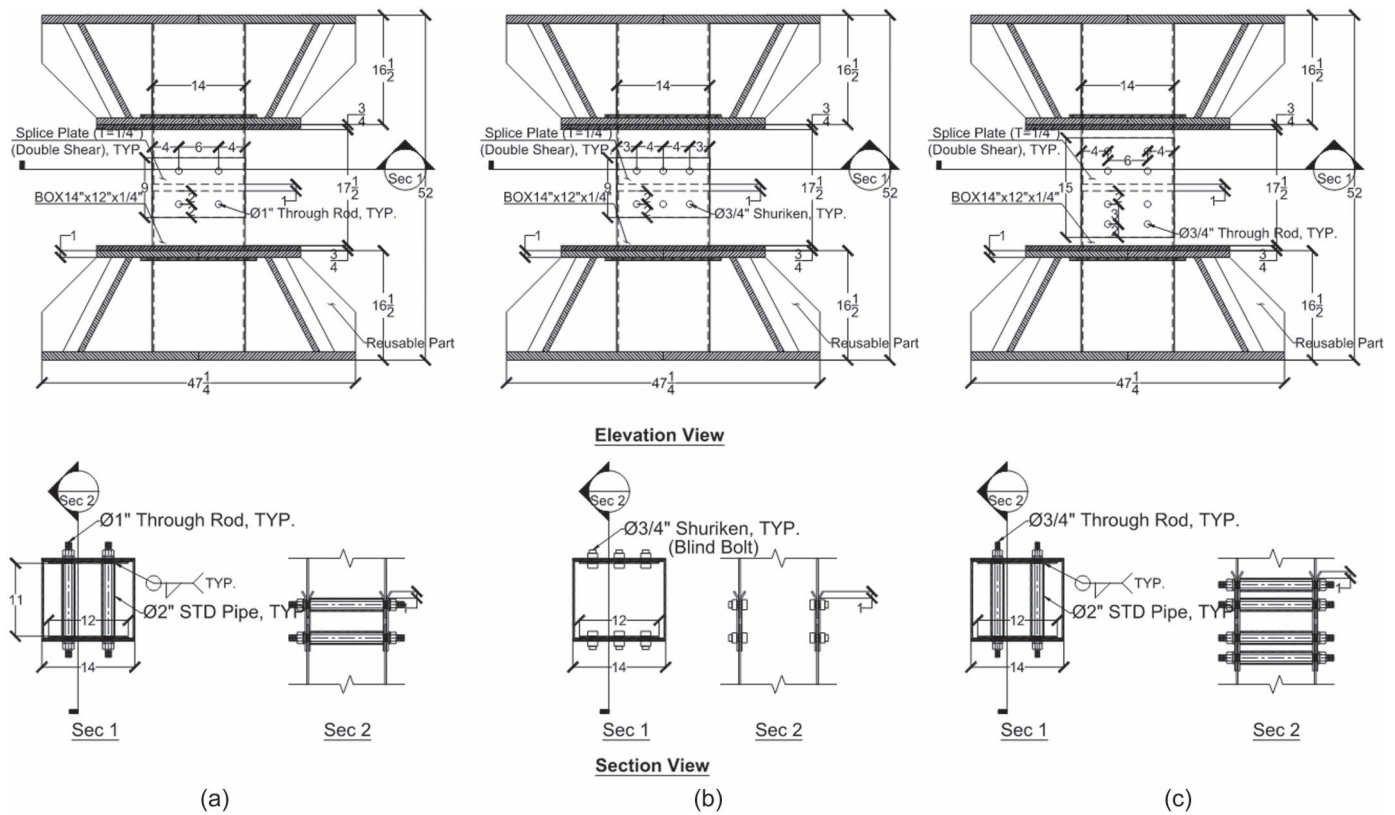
List of shear specimens: (a) Specimens S1 and S2; (b) Specimens S3 and S4; and (c) Specimens S5 and S6.
